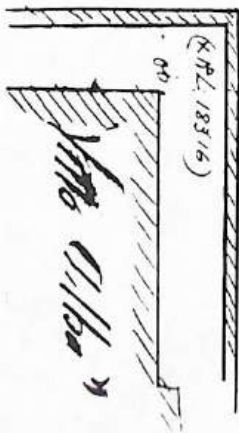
Billiard Room and Fernery, MMBW Detail Plan, Detail
